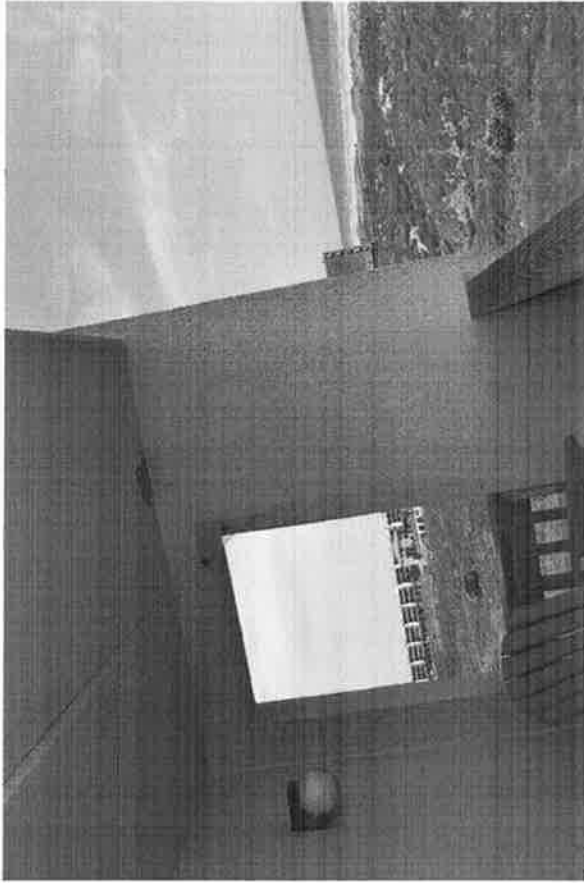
Existing repair to concrete surface of post tensioned hollow core concrete panel (typical)
